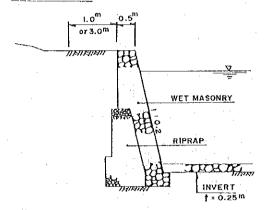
(2/2) STANDARD DRAWING OF RIVER CROSS SECTION
